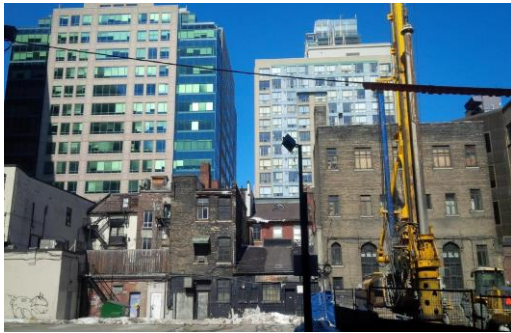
Picture showing how a new building (under construction) may take away the light of older dwellings in Toronto
